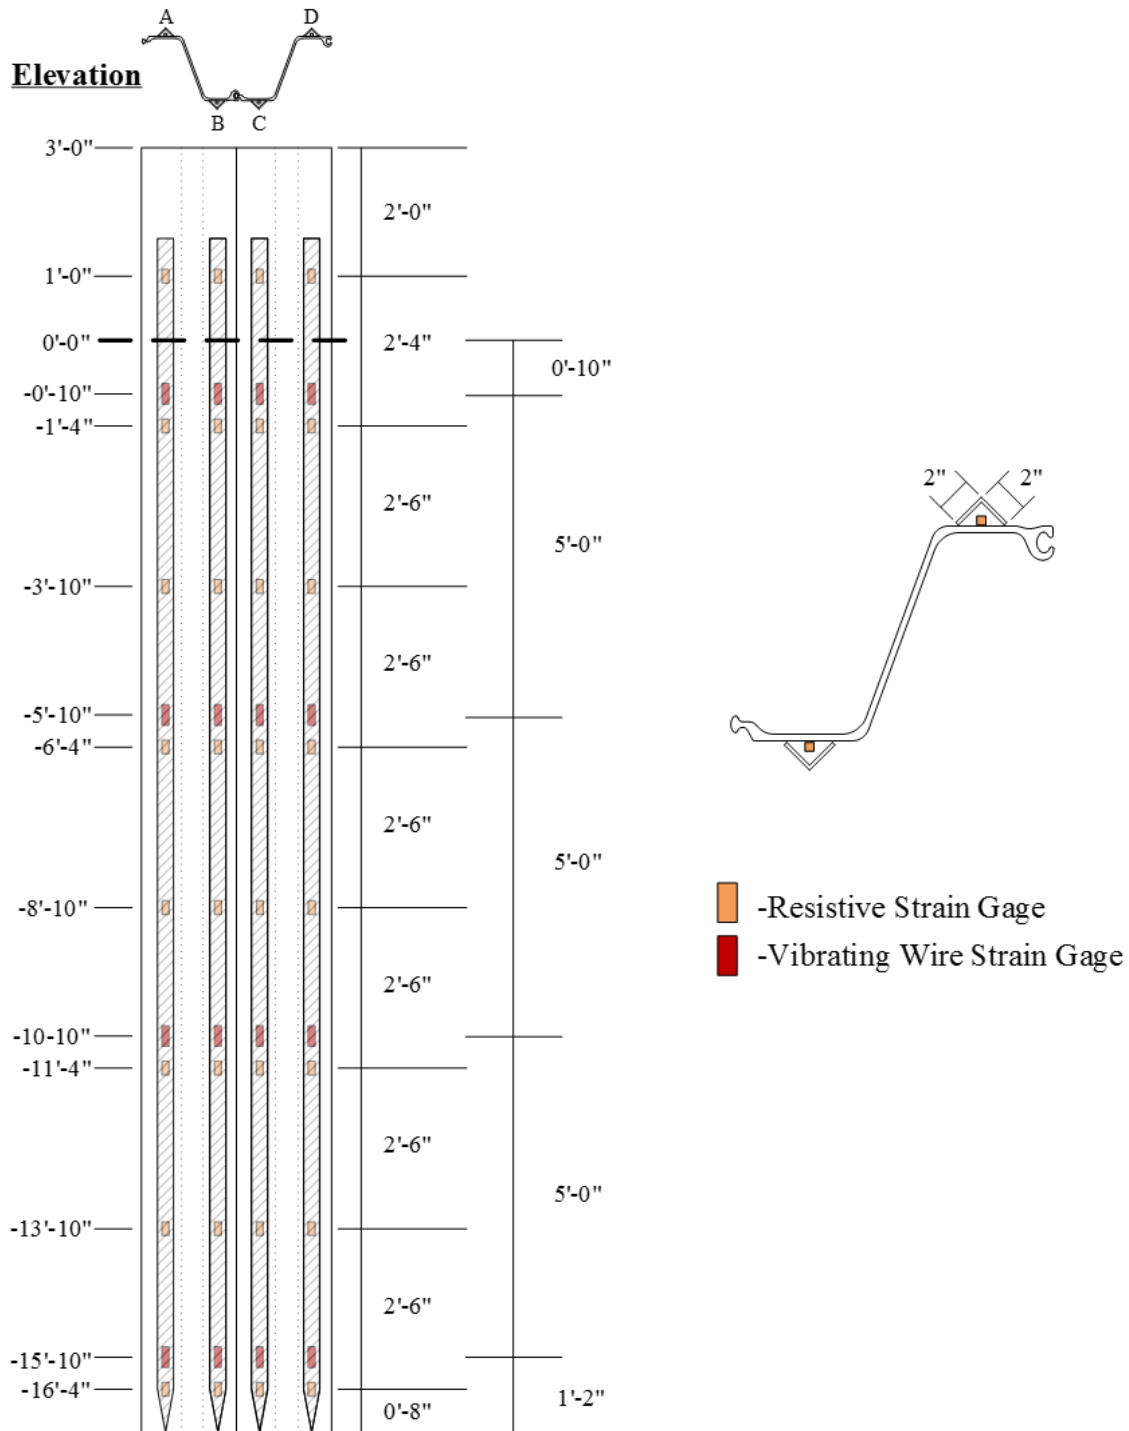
Layout of instrumentation for sheet pile tested at field site.
